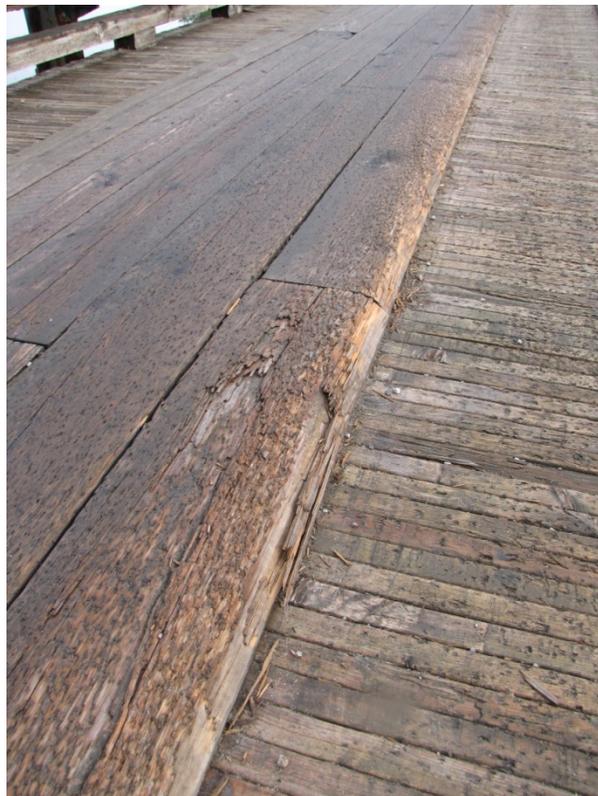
The edge of the inside wearing surface boards are typically rotten.
